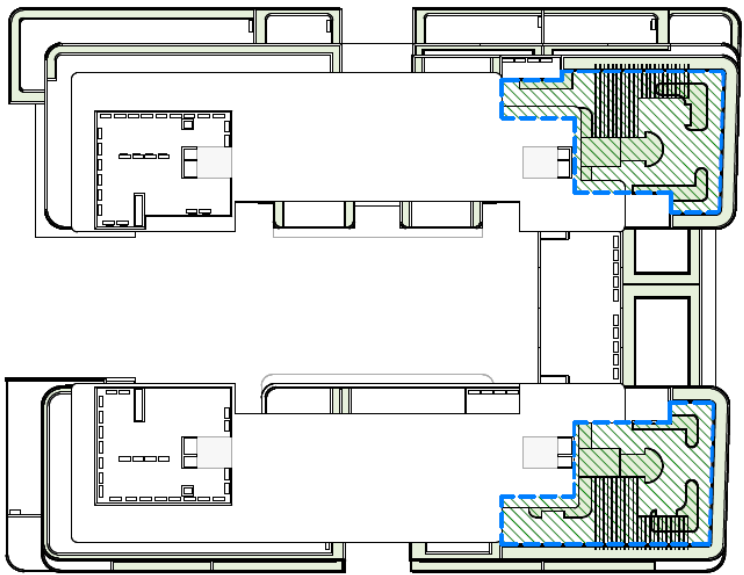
Communal Open Space Roof (Source: GilesTribe)
